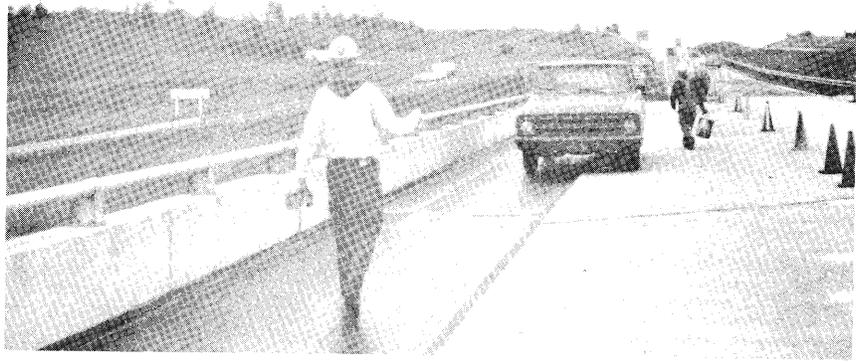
Rolling with light truck to set the laps between adjacent membrane sheets.
